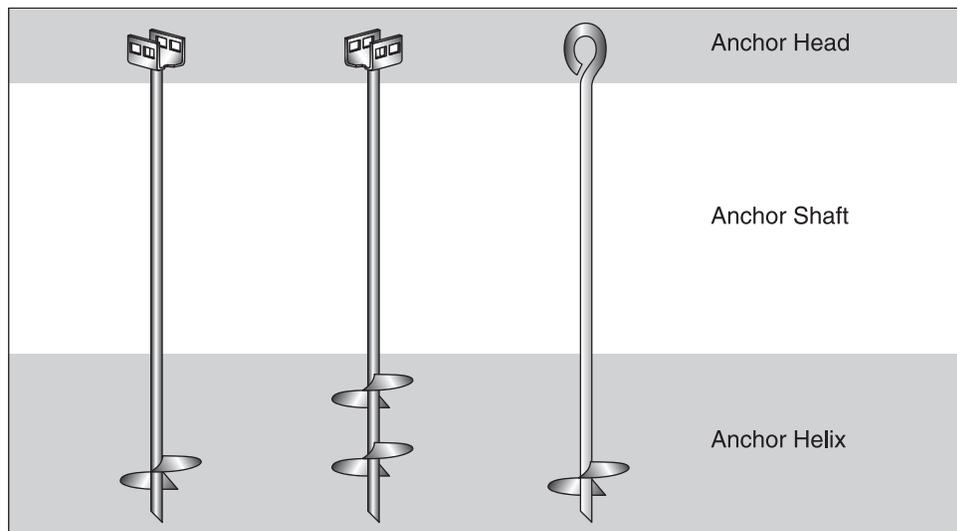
Single and double helix ground anchors with strap connection and single helix anchor with a closed-eye connection.
